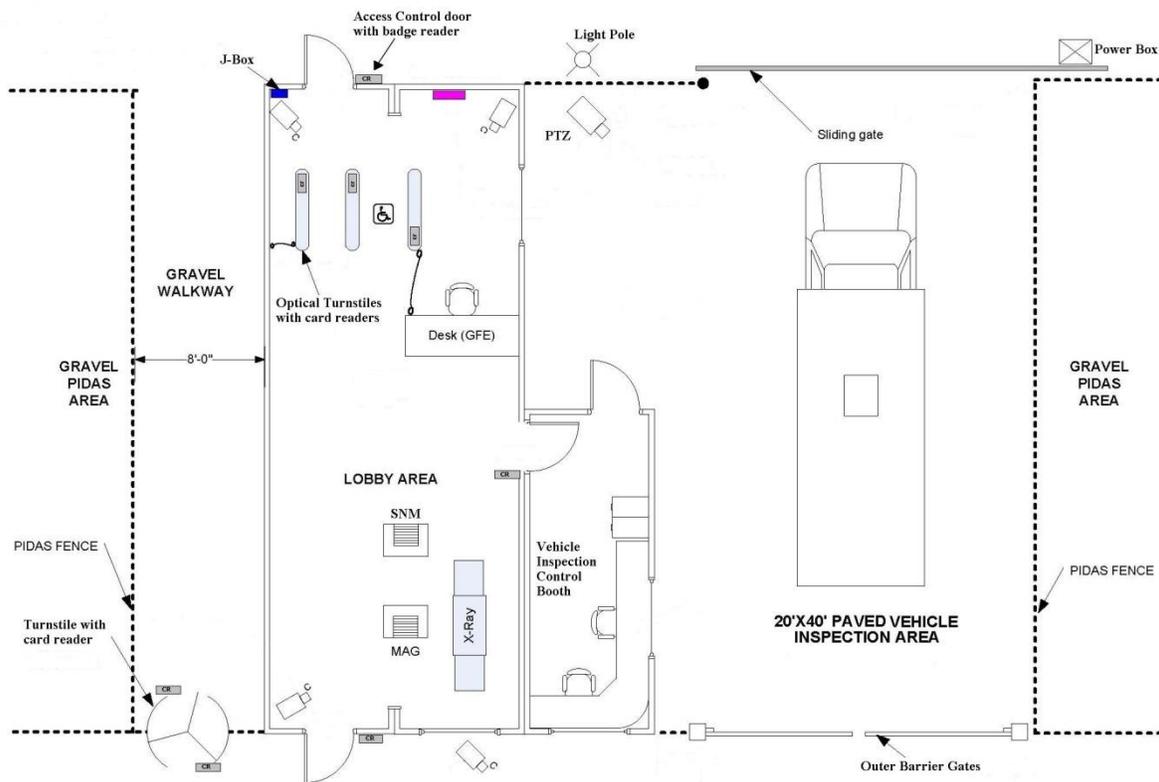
Floor Plan for Building 9825I, Simulated Entry Control Facility
